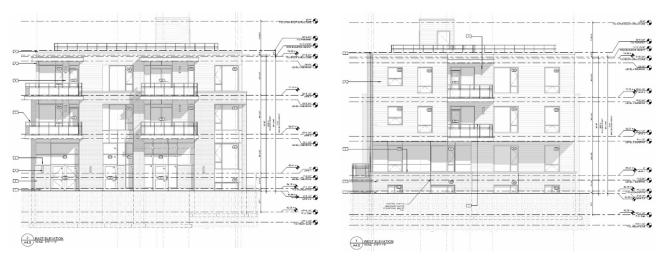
East (left) and West (right) Building Elevations showing Private Balconies
